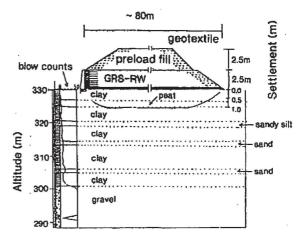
Typical cross-section of Nagano Shinkansen yard with a GRS-RW on one side (n.b., full-height full-height rigid facing was cast-in-place after the preload fill had been removed).
